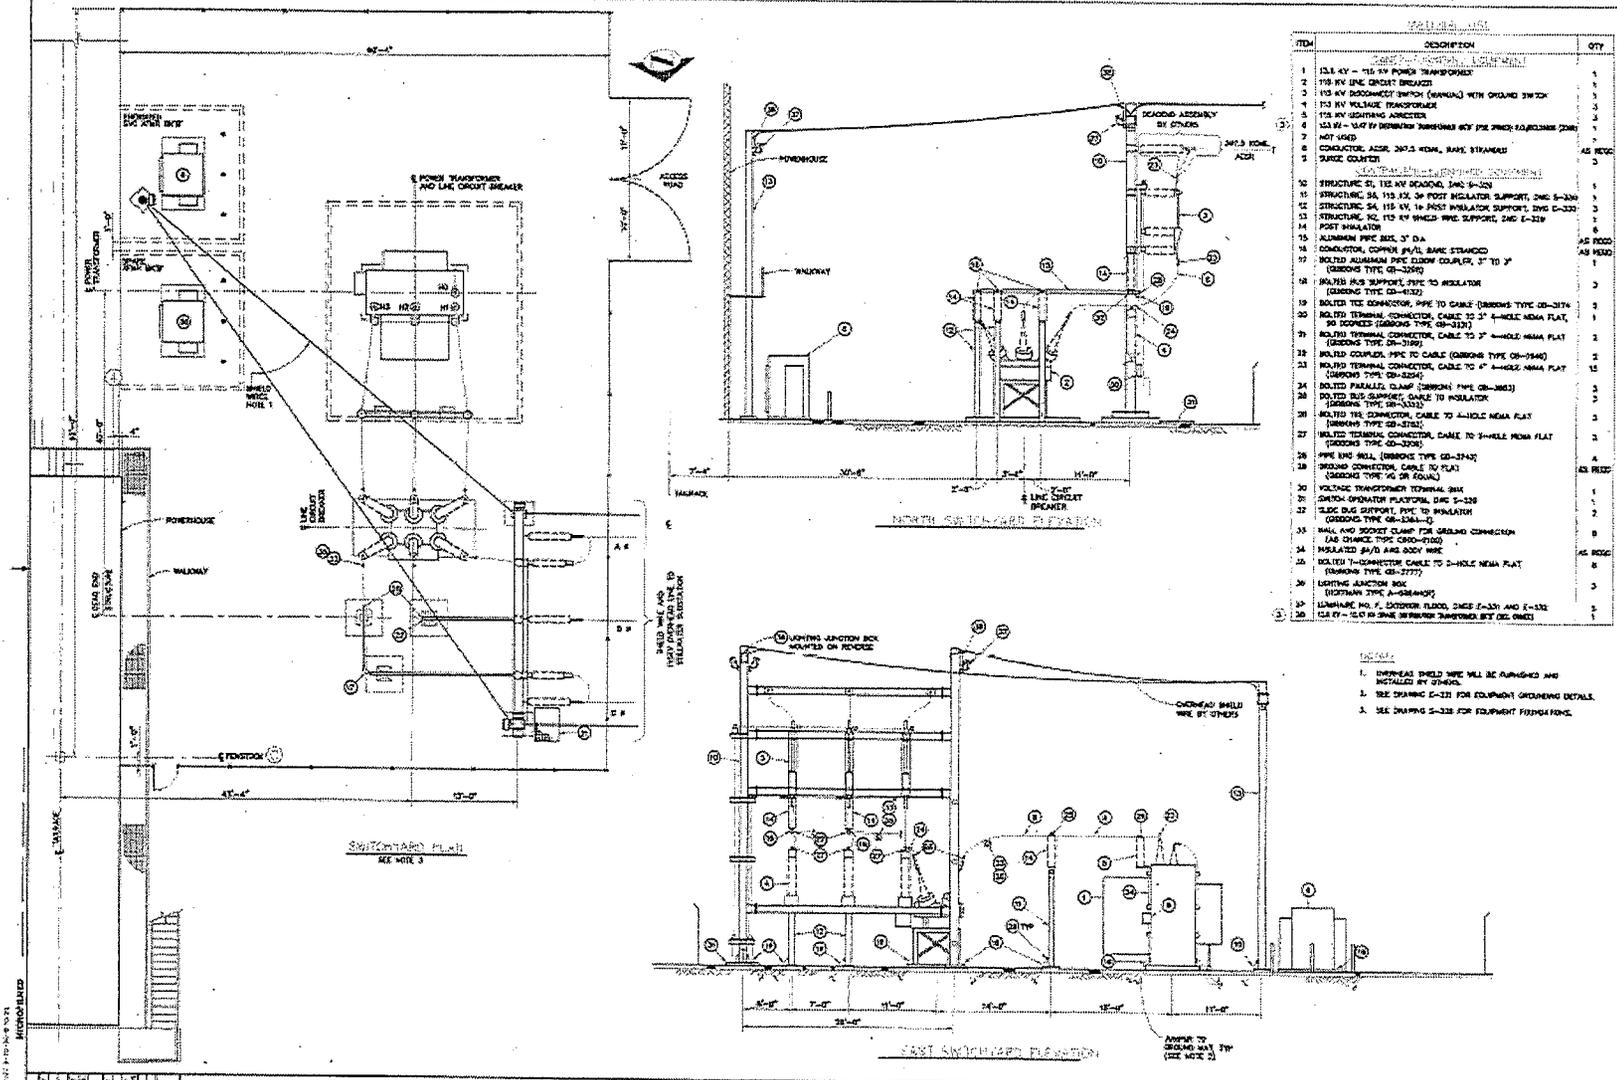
Exhibit B: City Light Powerhouse Switchyard Electrical Plan and Sections—D-32392
